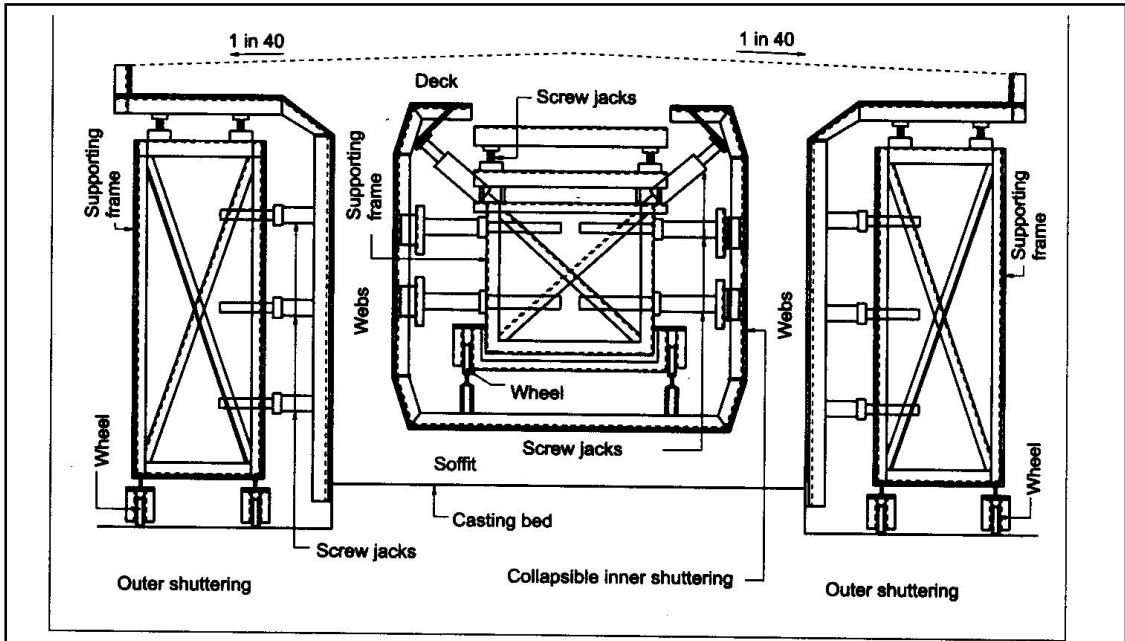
Shuttering detail for single pour casting of box girder of E-18 viaduct
